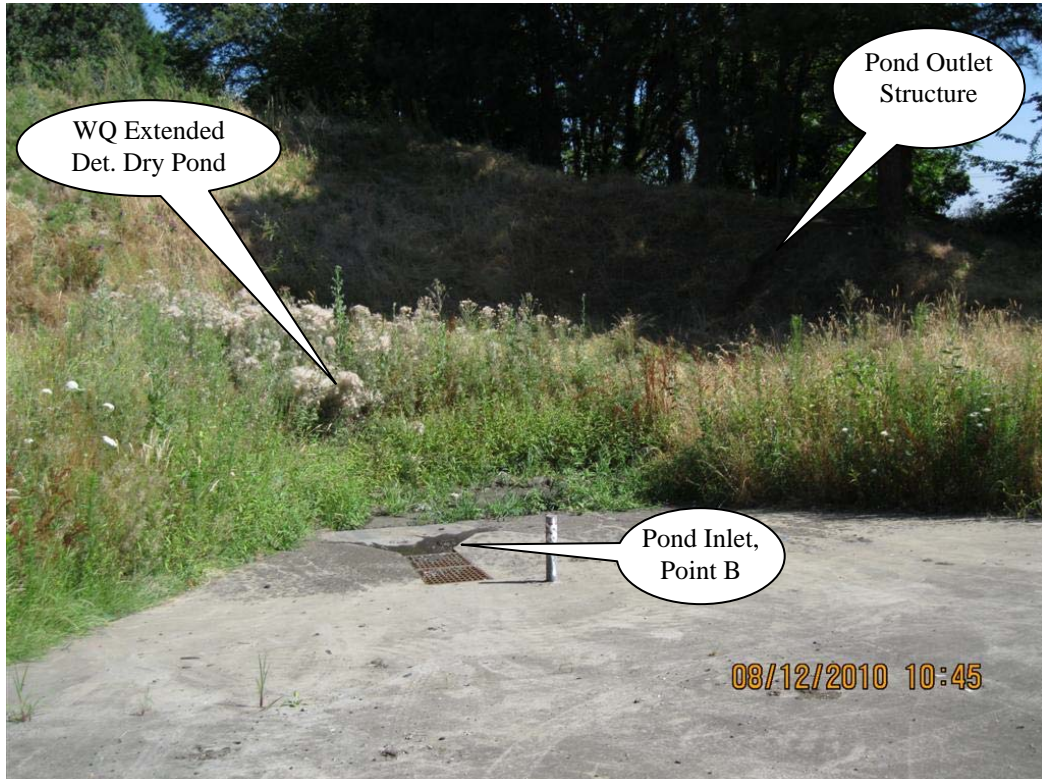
This photo is taken from near the water quality manhole (DFI D00288) looking into the extended det. dry pond.
